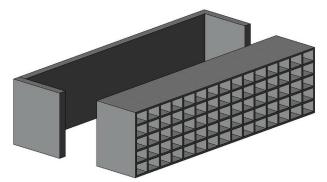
Distribution-structural scheme of the columbarium with external box in masonry and inner precast concrete elements.
